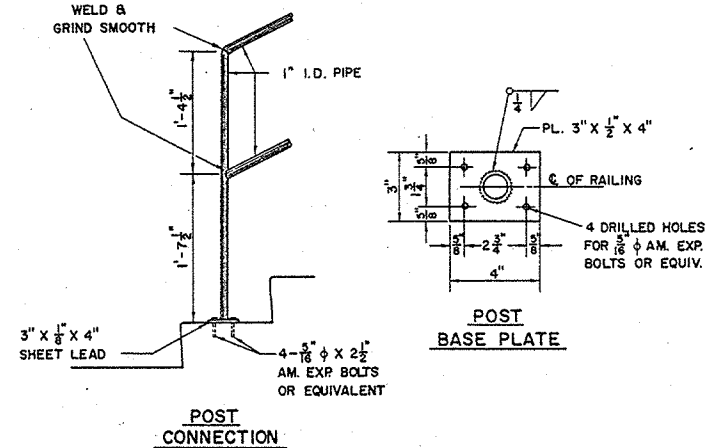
DETAILS FOR CONC. STEPS & PIPE RAILING WITH PIPE POSTS
